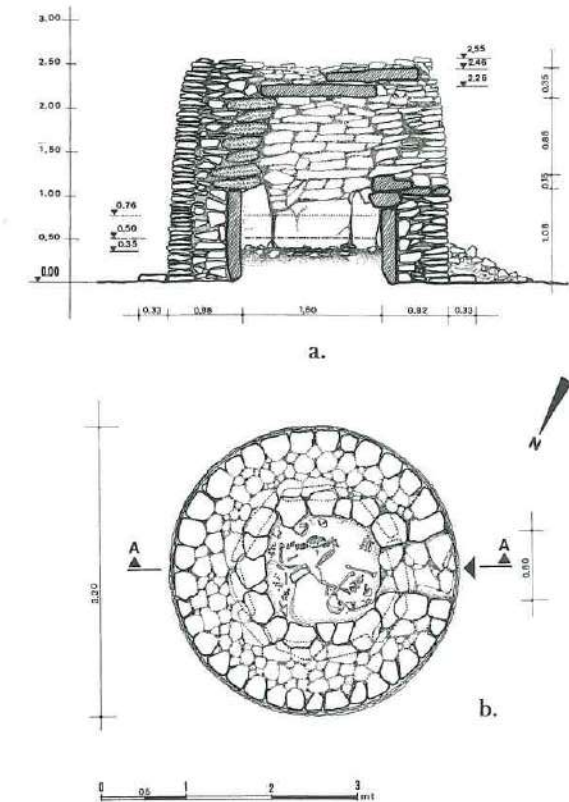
Tomb MKDiii/T9: a) section A-A; b) plan of level 1.
